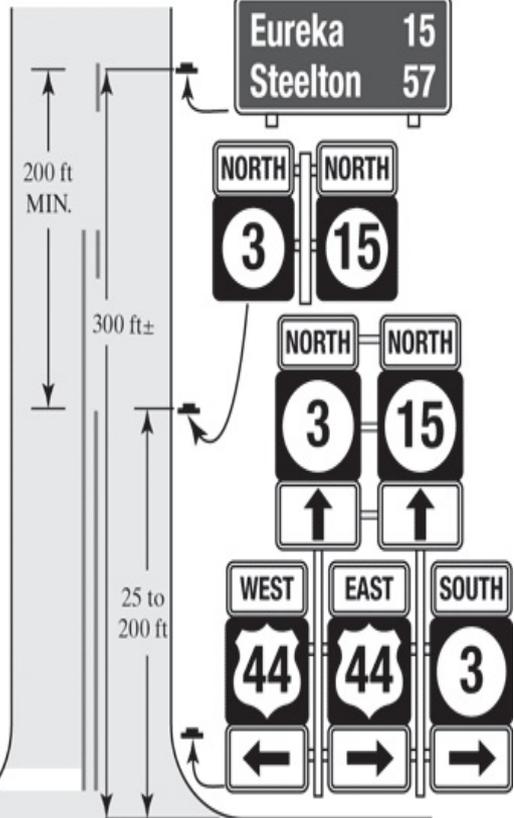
(#) shows two typical examples of the use of route sign assemblies. Both show signing in only one direction. Each approach to the intersection would have similar signing.
